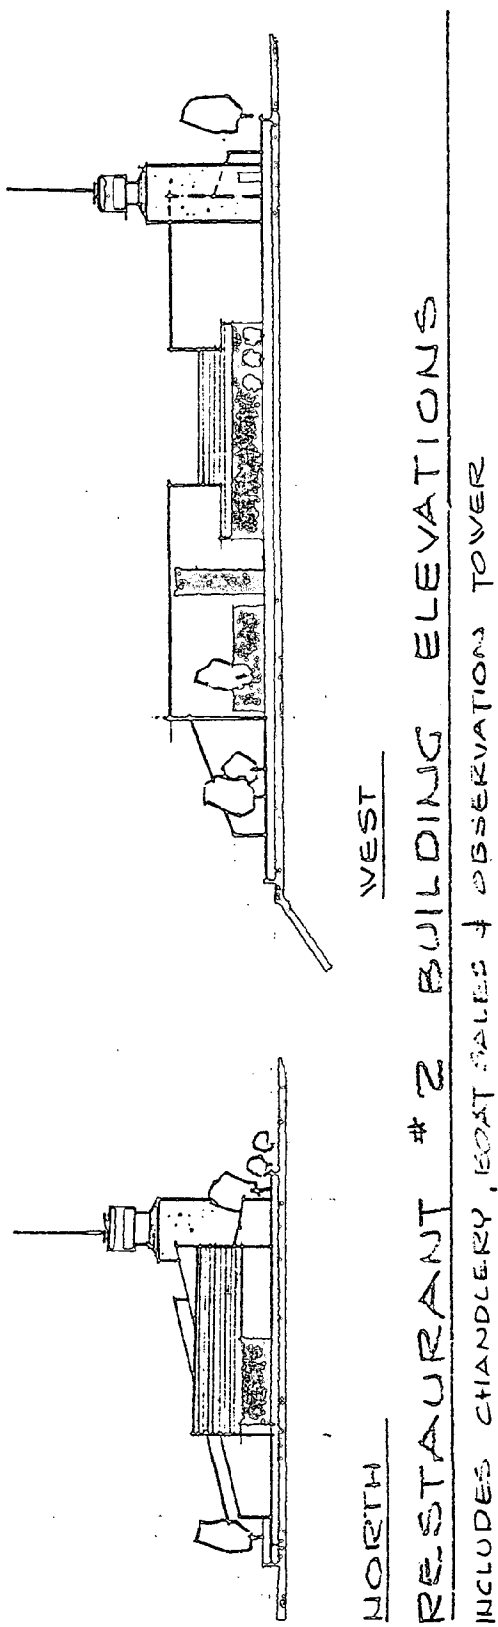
SCHEMATIC BUILDING ELEVATIONS
